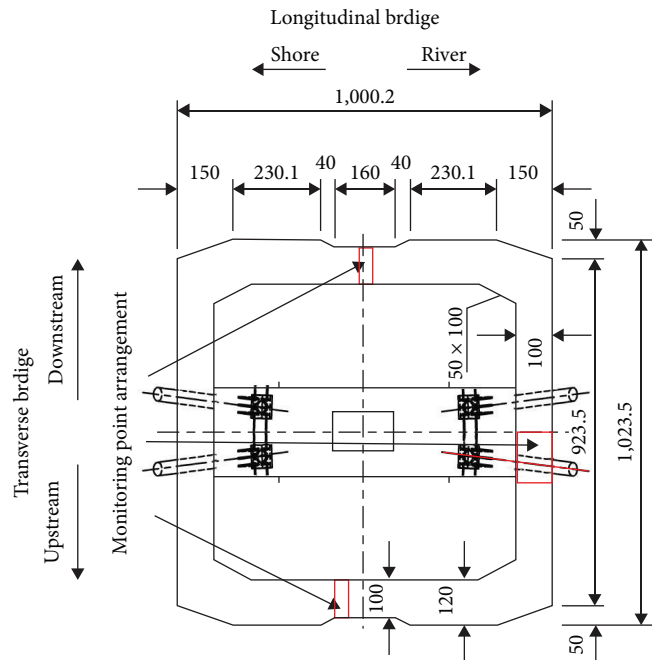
Structure of the elevation plane section of the top anchorage zone (unit: cm).
